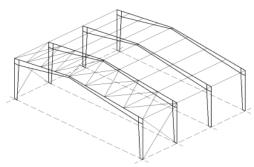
Horizontal bracing (in the roof) in a single Storey building
